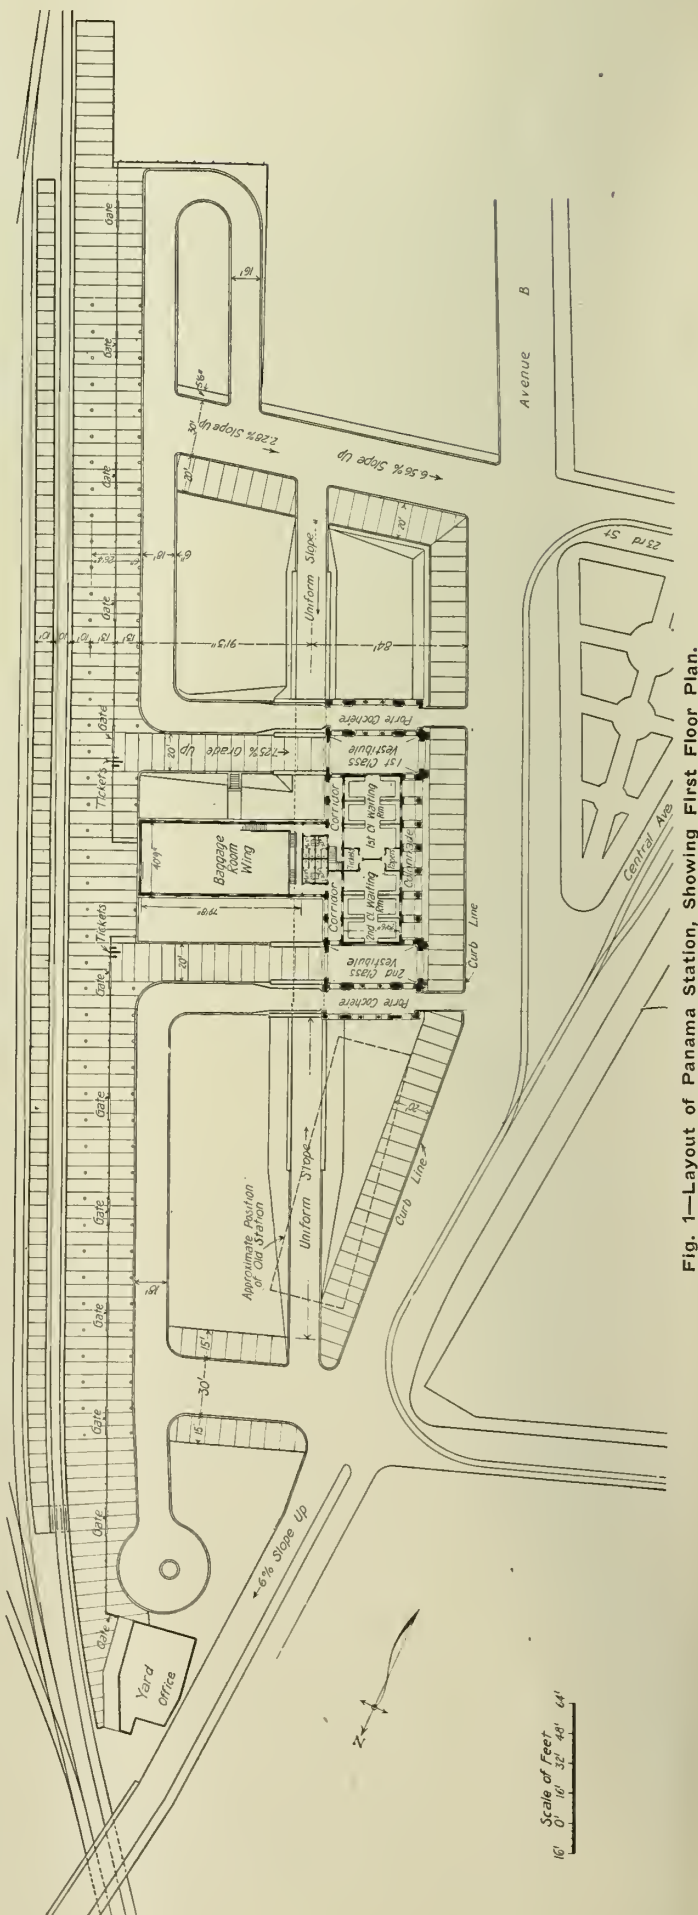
Layout of Panama Station, Showing First Floor Plan.
